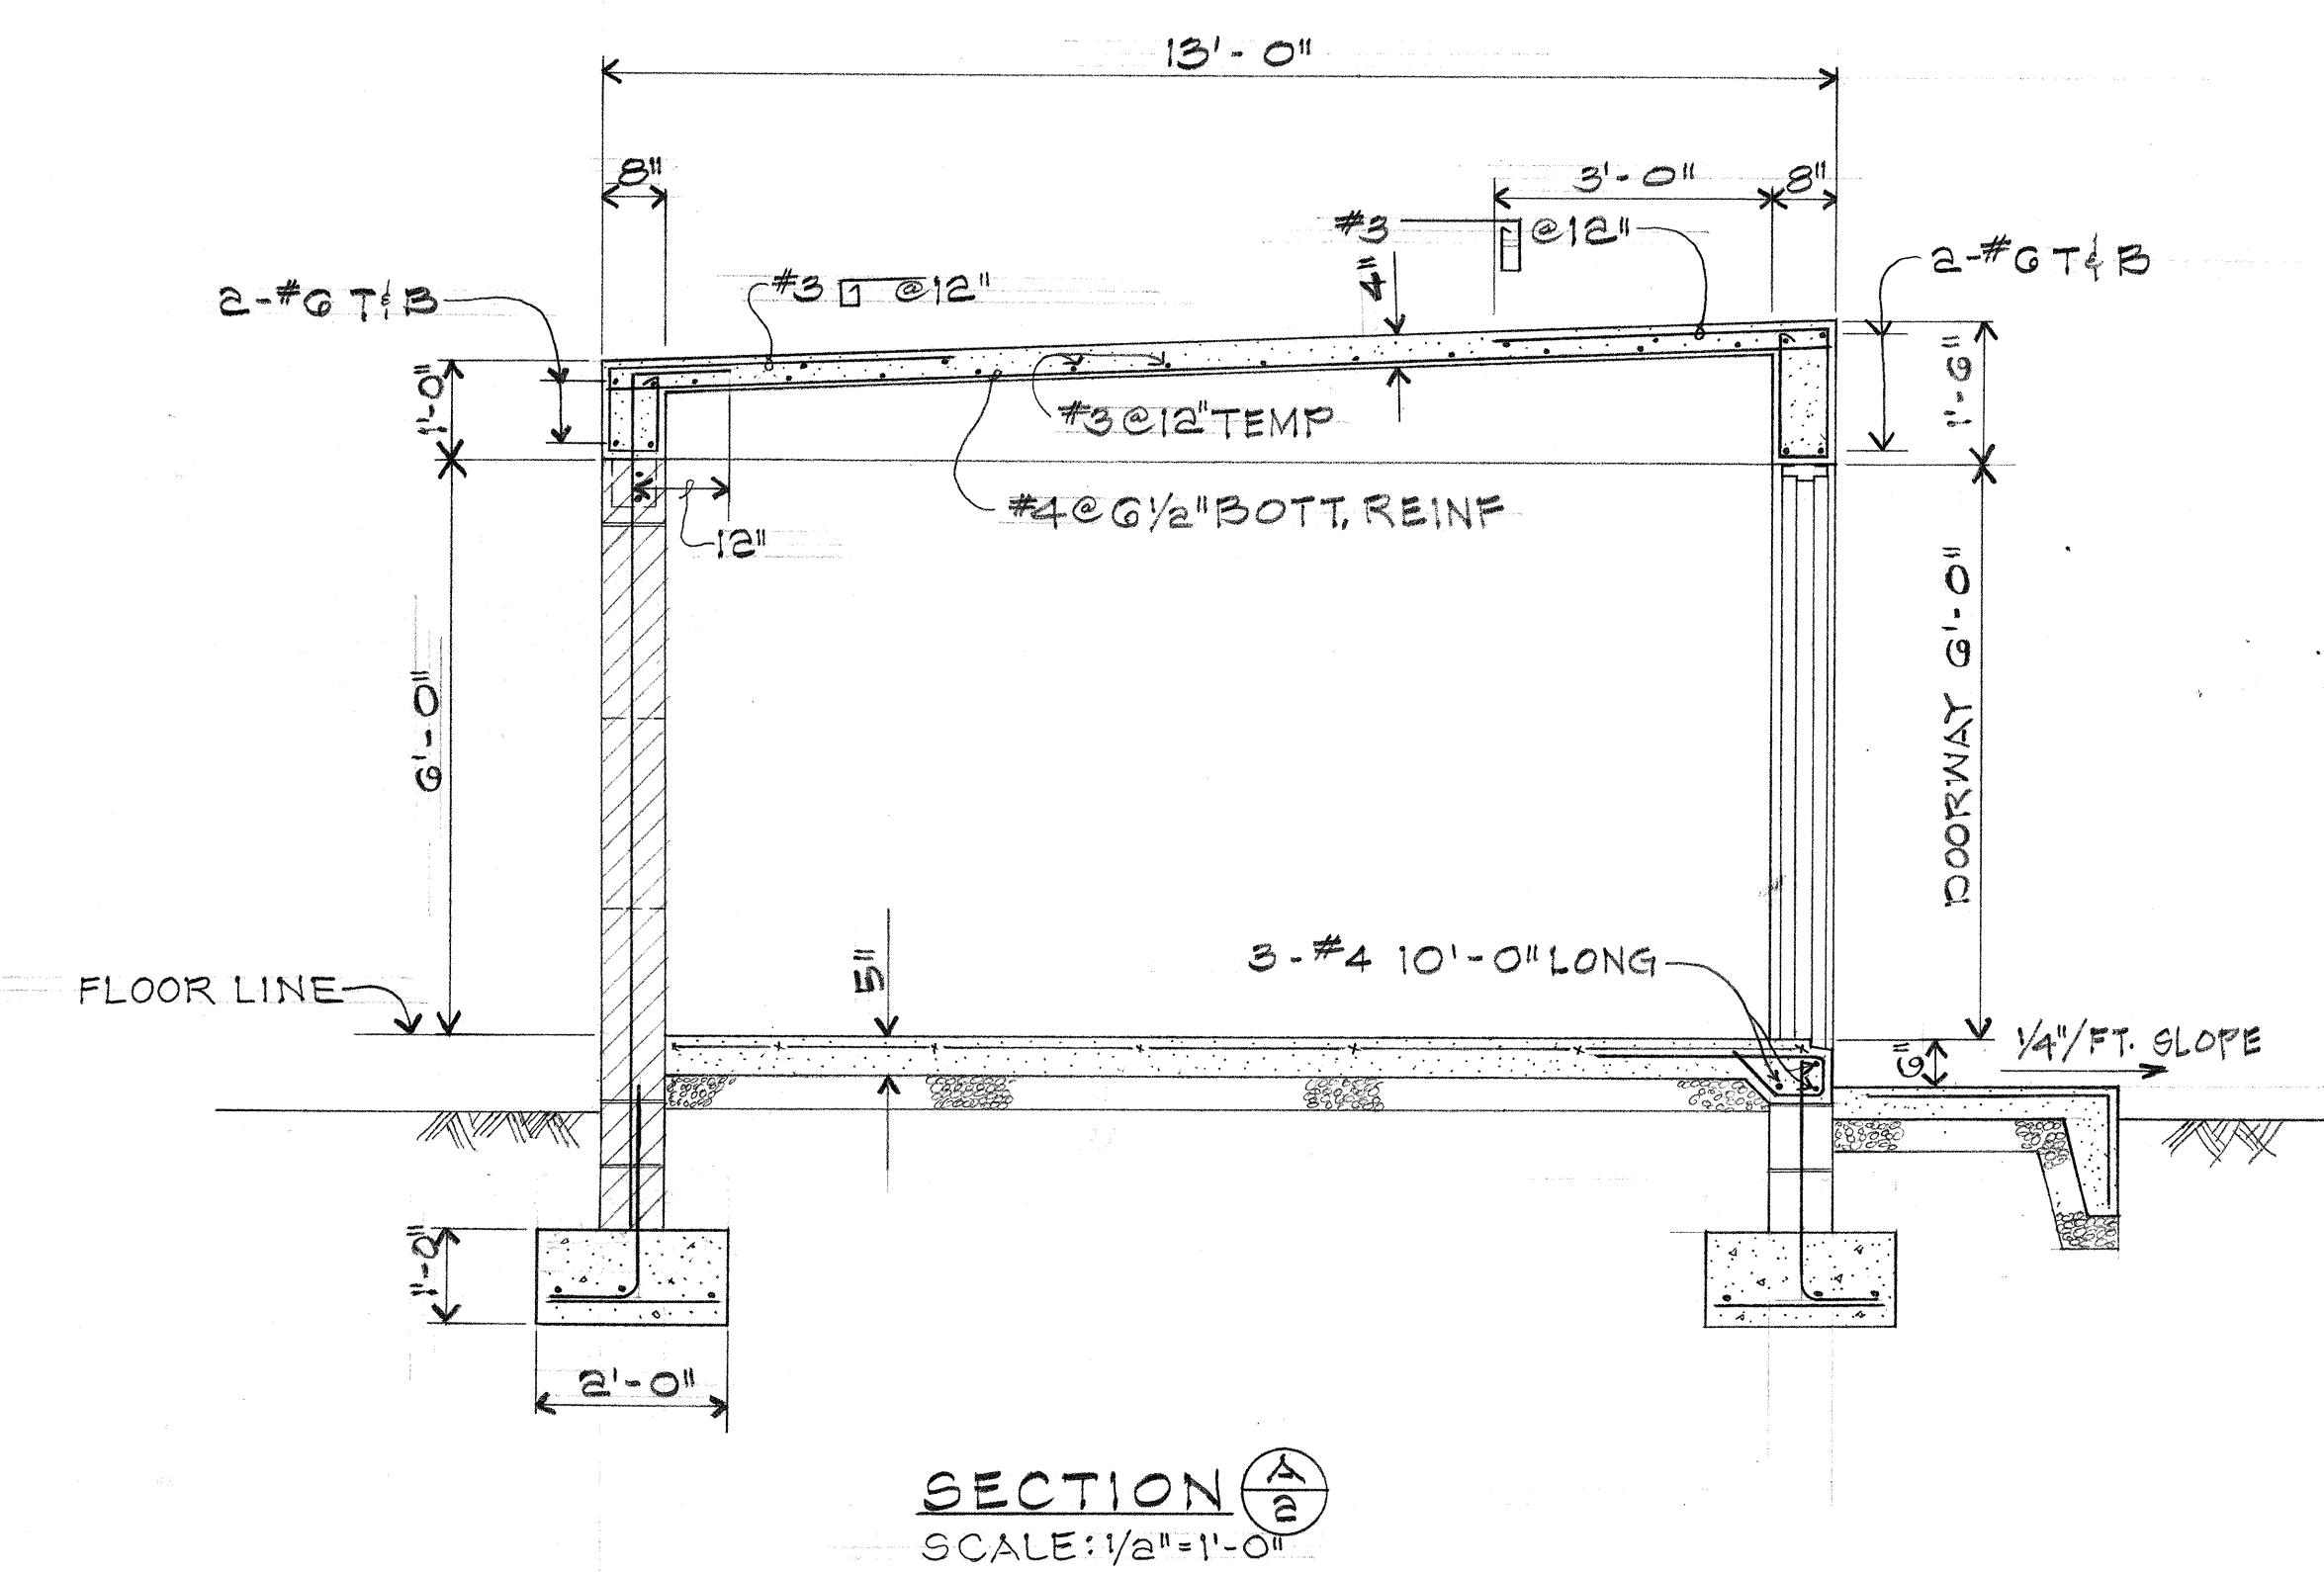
/25 PUMP HOUSE FOR TWO PUMPS
